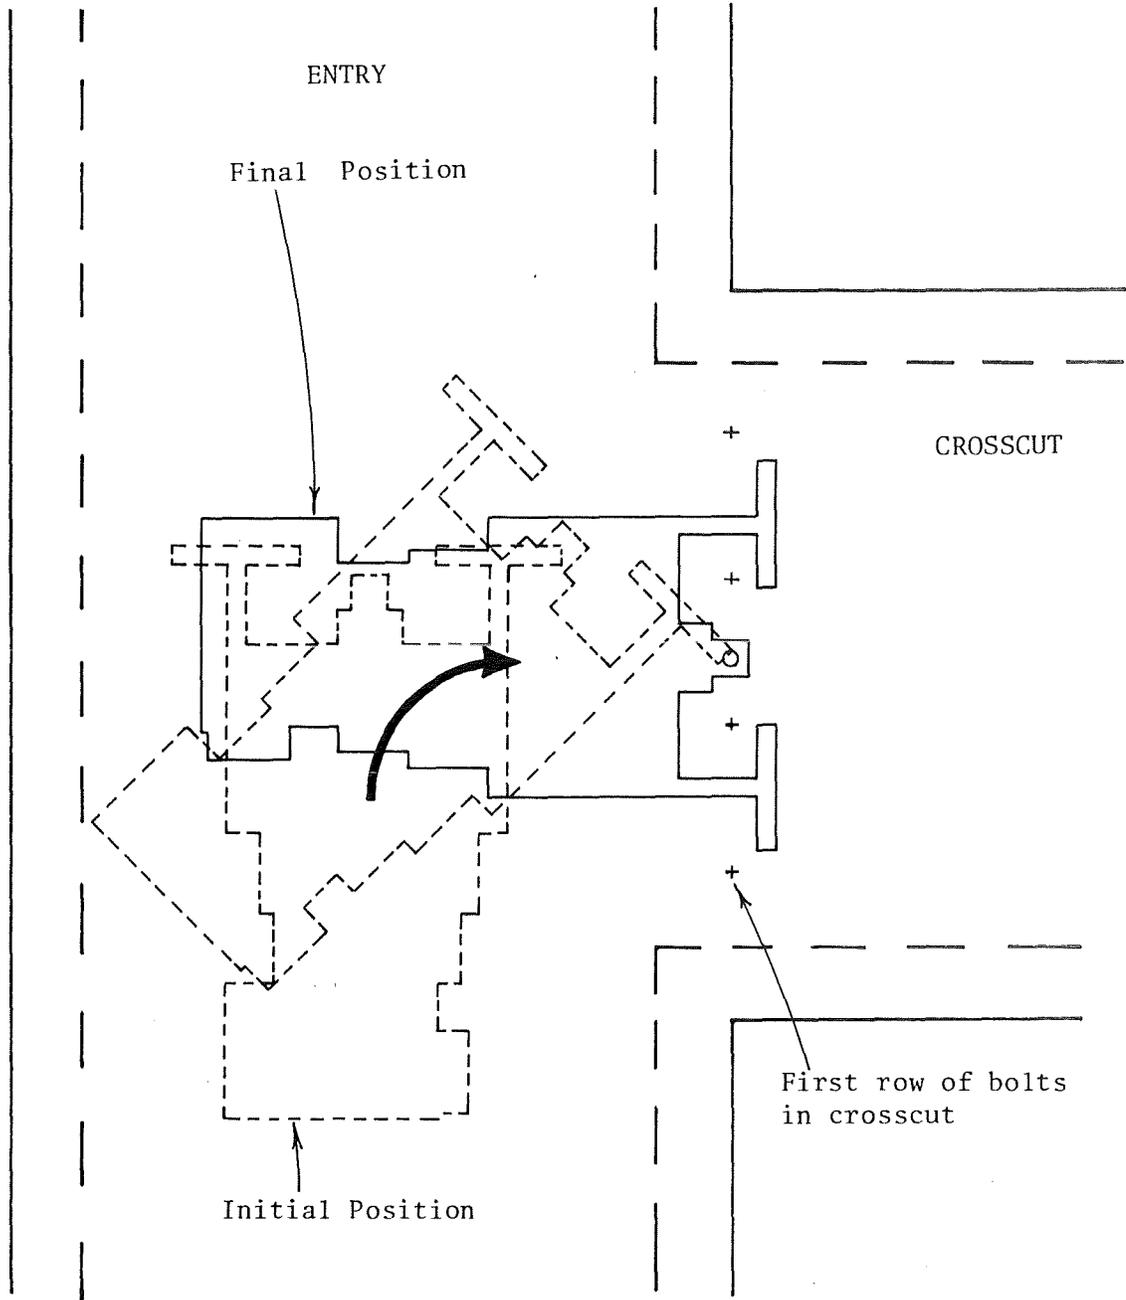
Bolter Turning Into Crosscut Through a Short Turning Radius Which Delivers Bolter to Proper Position for Bolting First Row
